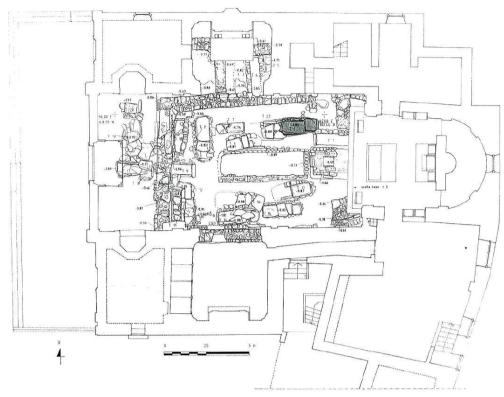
Church of St. Michael of Mornago, plan of the excavation.
